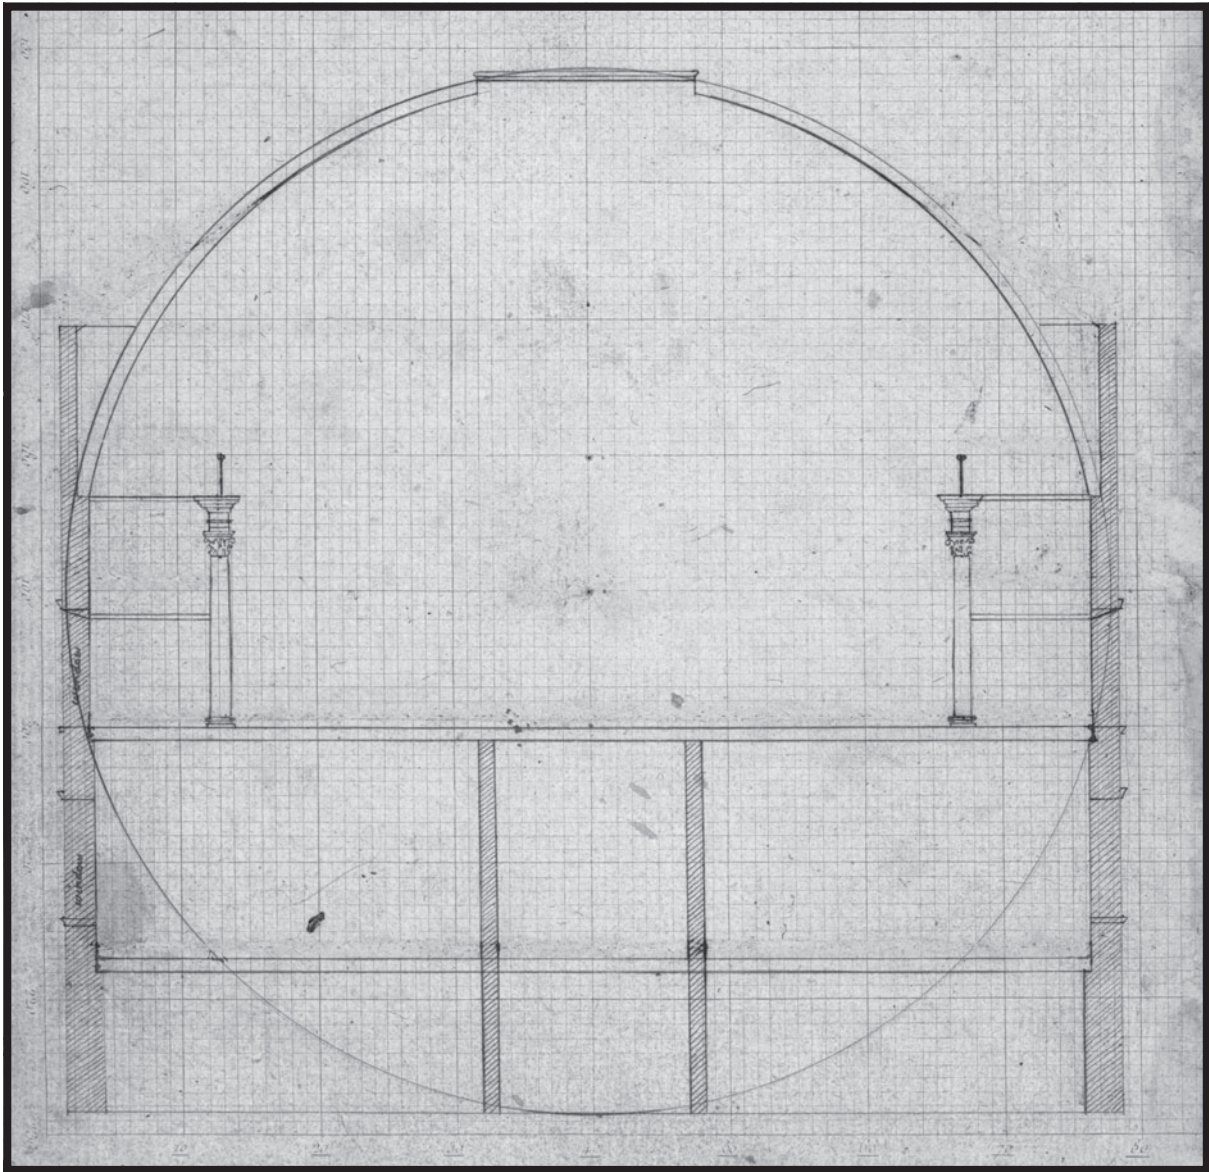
Thomas Jefferson, building section of the Rotunda, drawing begun 1818, completed by March 29, 1819.
